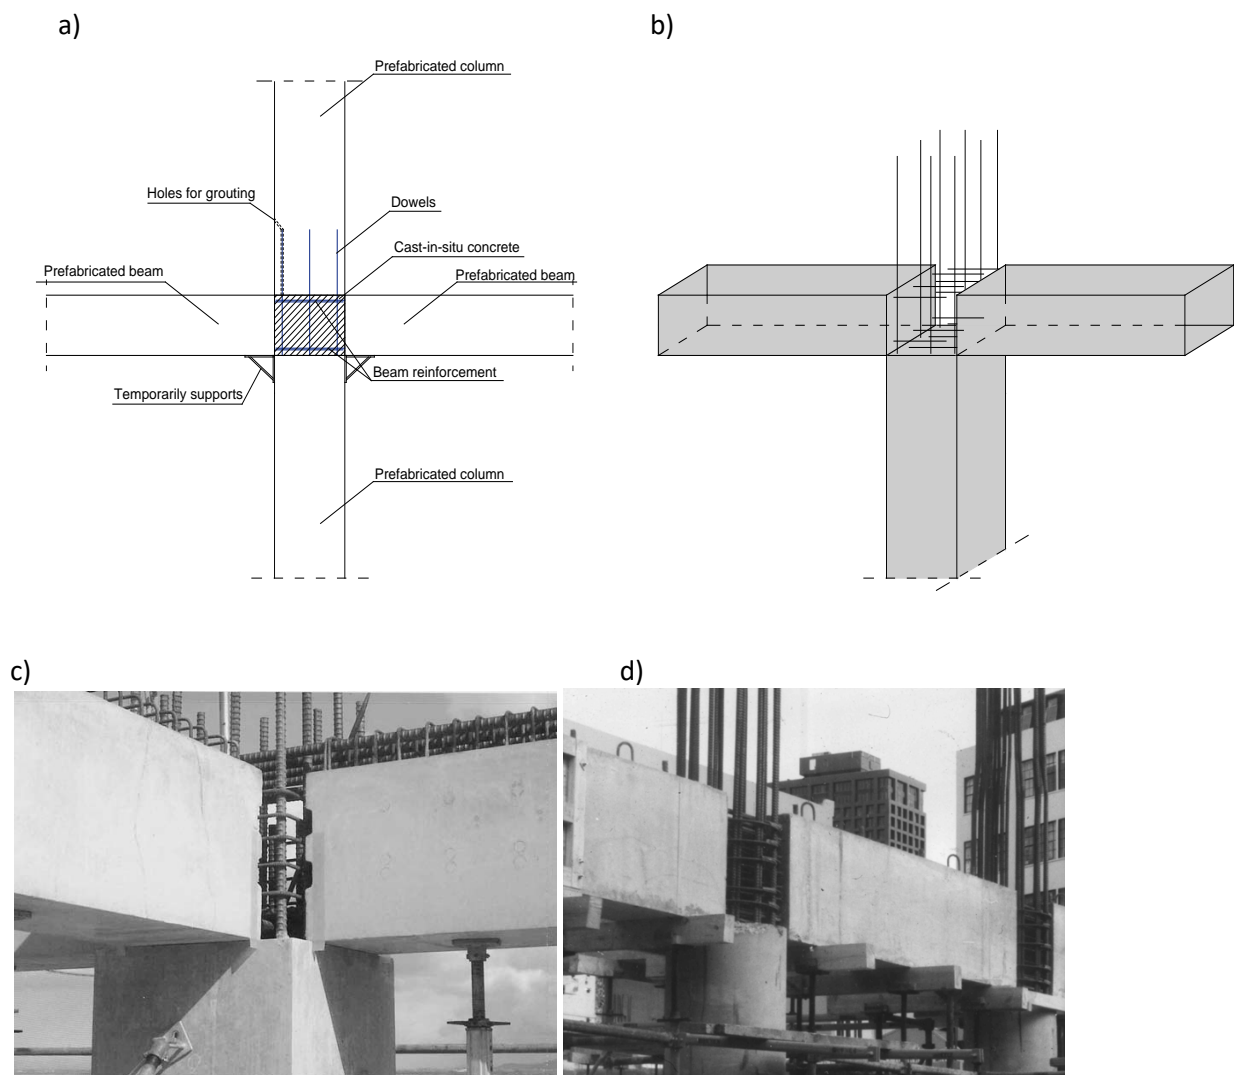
Examples of beam-to-column fixed (moment resisting) connection realized as wet connections
